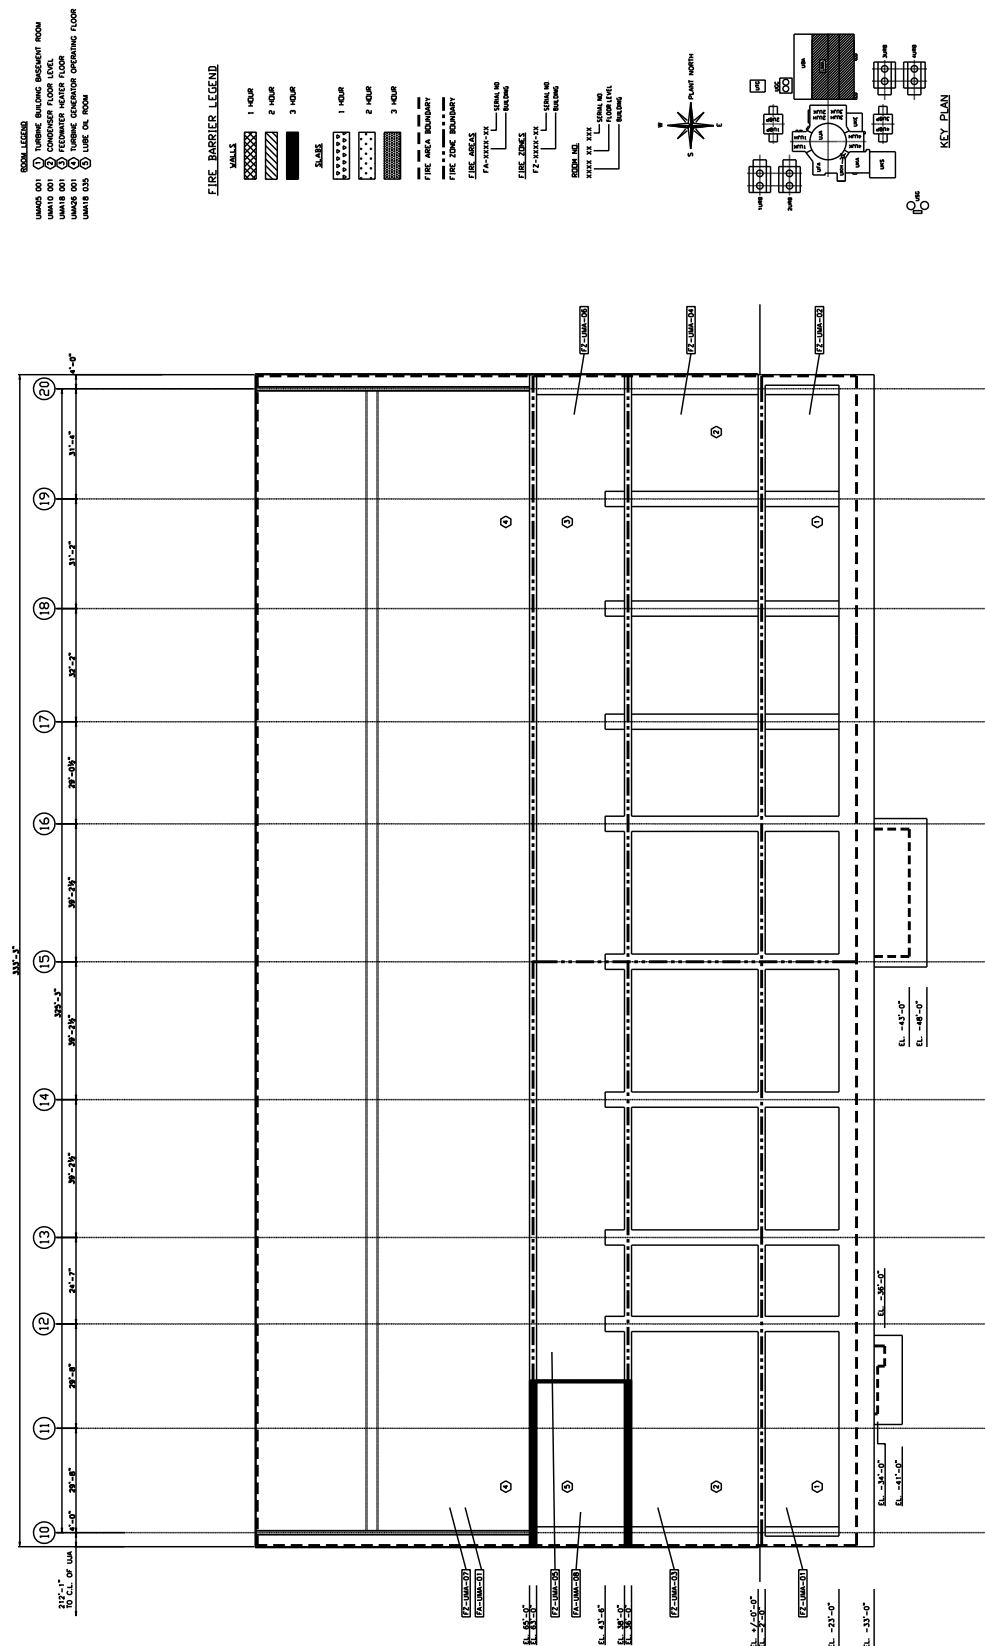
B-8—{Fire Barrier Location, Turbine Building Section B-B}
